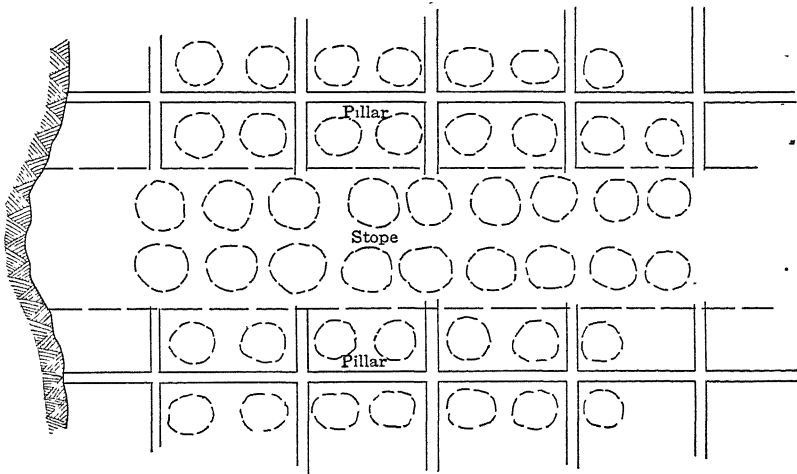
PLAN OF SHRINKAGE STOPE FLOOR SHOWING ARRANGEMENT OF RAISES.
